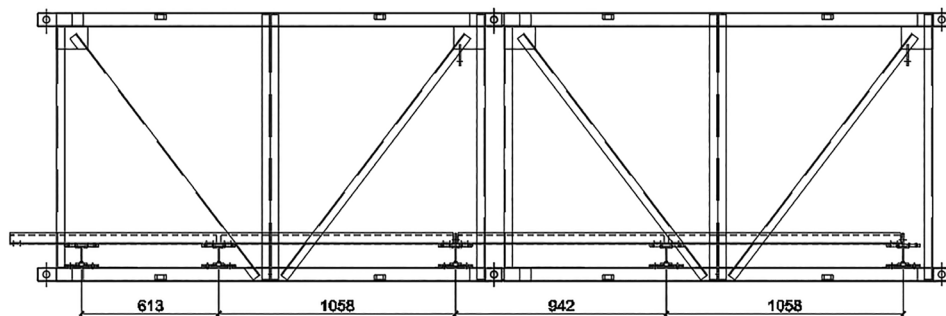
Elevation drawing of assembled transoms, angle steel bar and grille steel plates (1st and 2nd sections) (unit: mm)
